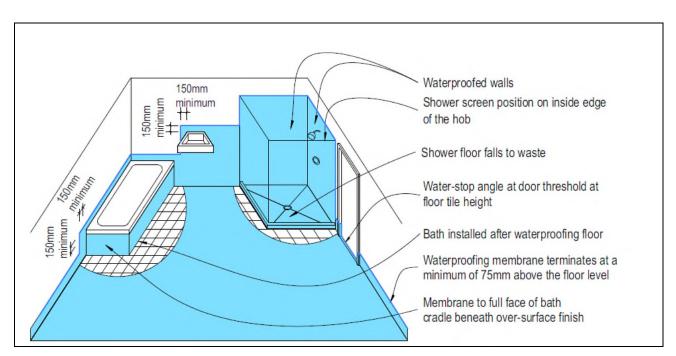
Typical extent of membrane in bathroom with hob to shower area
